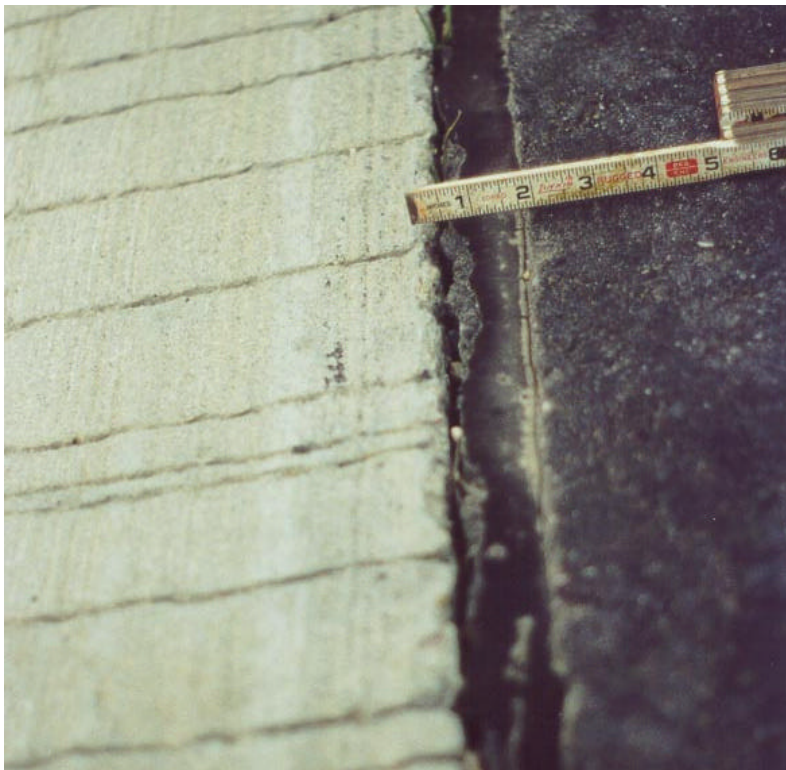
Longitudinal joint seal failure in one of the control sections.
